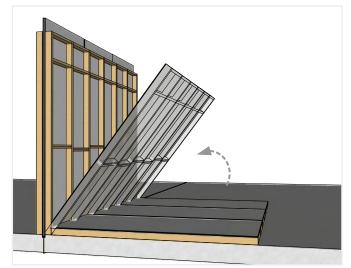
LIFT AND ANCHOR - WALL MODULES
